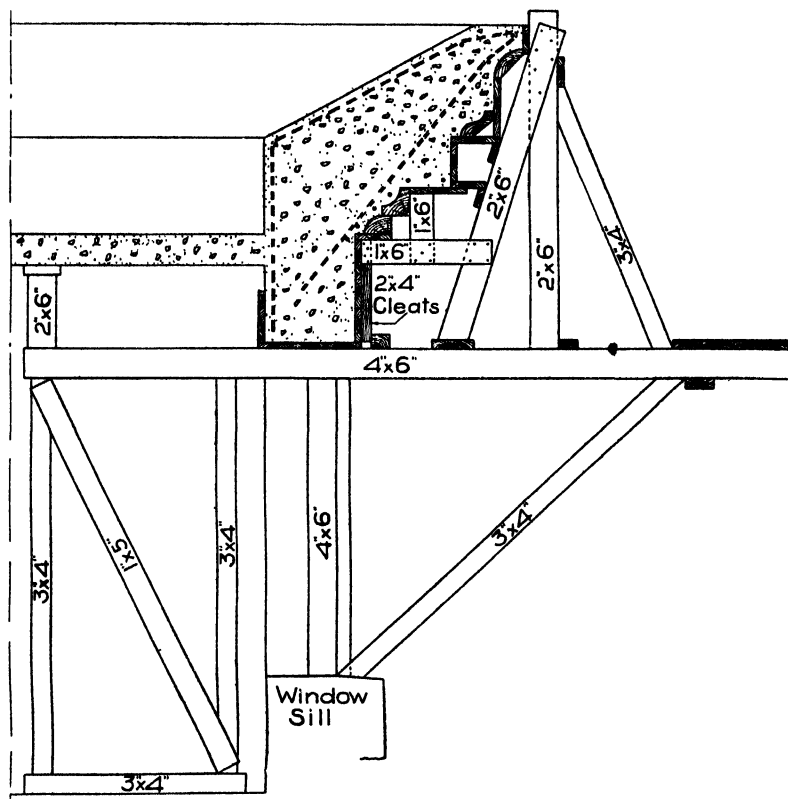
Design of Overhanging Cornice Cast in Place. (See p. 645.)
